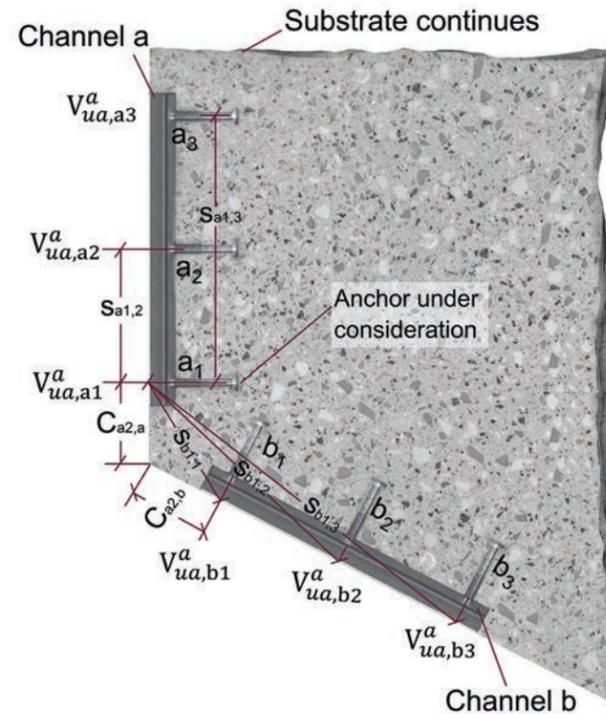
Obtuse FoS corner with anchor channels on both sides —Example of determination of $\psi_{s,v,a1}$.
